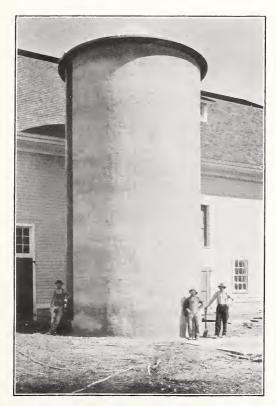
Concrete Silo at the Wisconsin College and Station.
